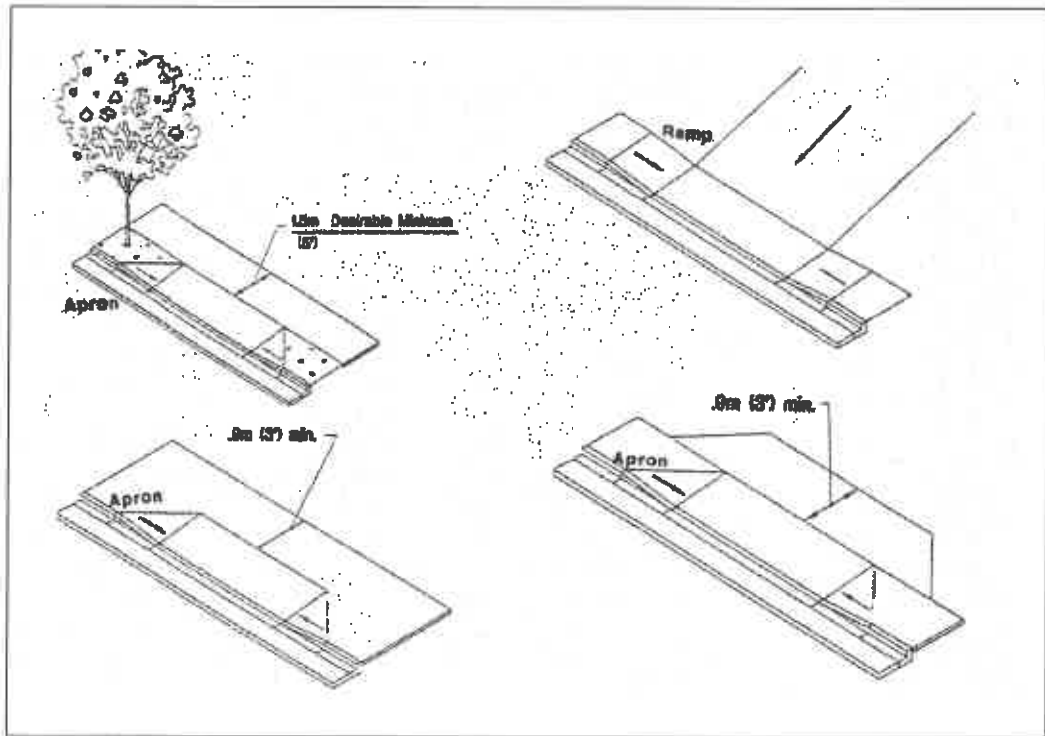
Figure A Examples of Acceptable Driveway Openings Next to Sidewalks/Walkways
